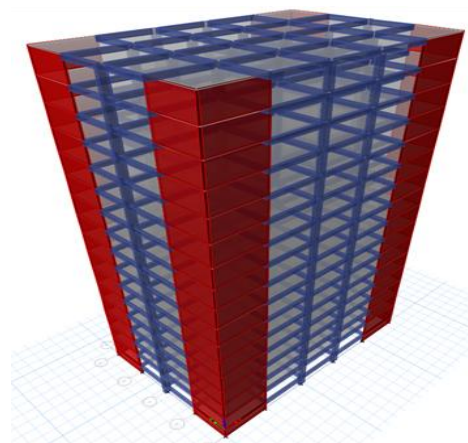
3D view of G+15 RC frame building with outer shear wall
